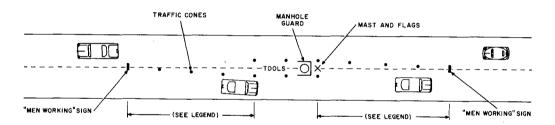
Placement of Warning Devices on City Street Without Truck—Underground Plant Near Center of Street
